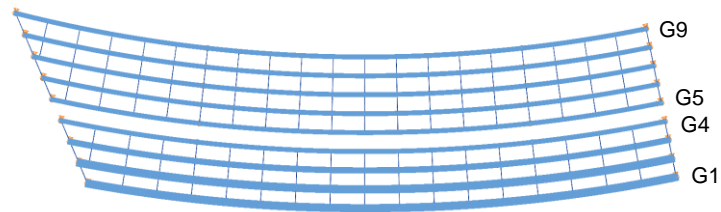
NISCS37, girder vertical deflections under steel dead load.
